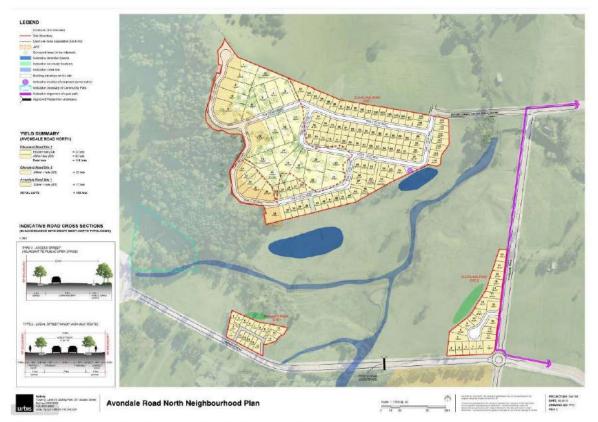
Avondale Road North, Huntley Neighbourhood Plan
